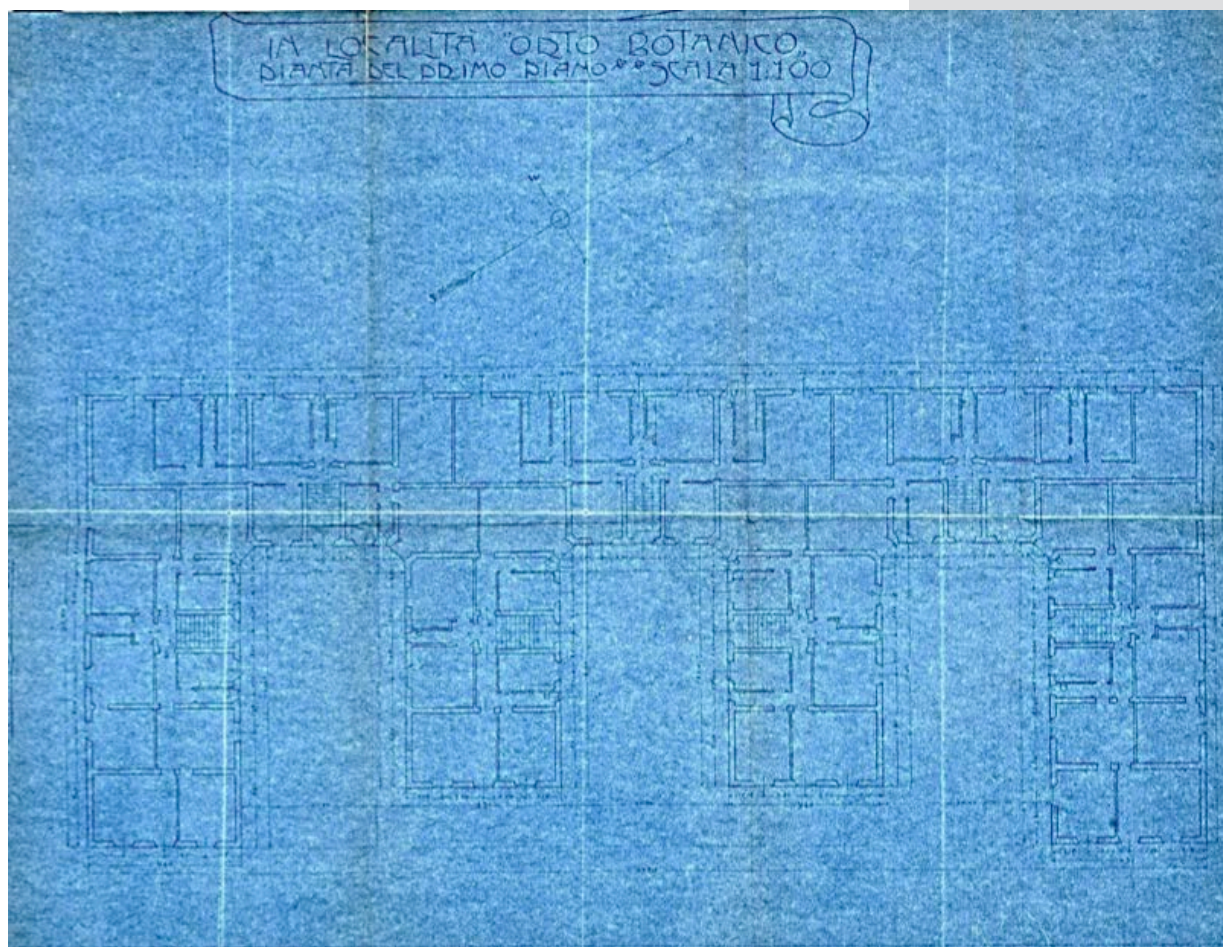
Messinian Union Housings, left block, first floor plan [9].
